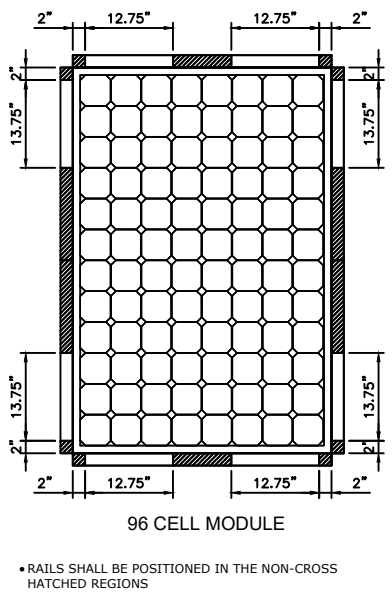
MOUNTING CLAMP POSITIONING DETAILS
